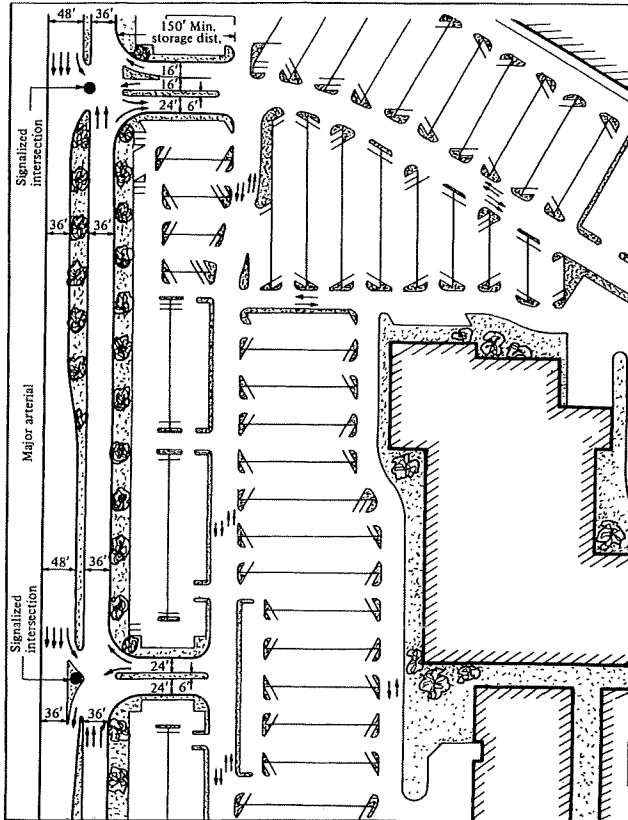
Sketch of site plan with desirable access and parking-aisle arrangement. Note that building setback must be at least 400 feet in order to provide adequate throat length and parking aisles of reasonable length.
